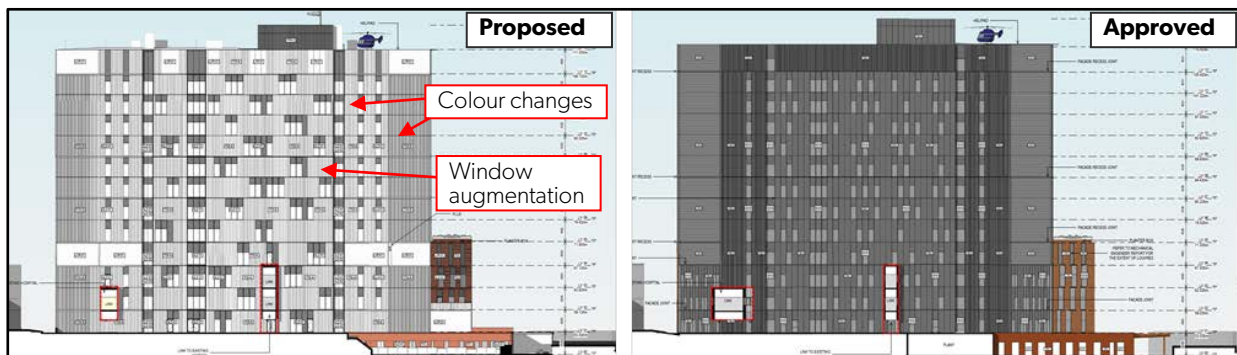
| Proposed (left) and Approved (right) Southern Elevation (Source: Modification Application and Approved Plans)
